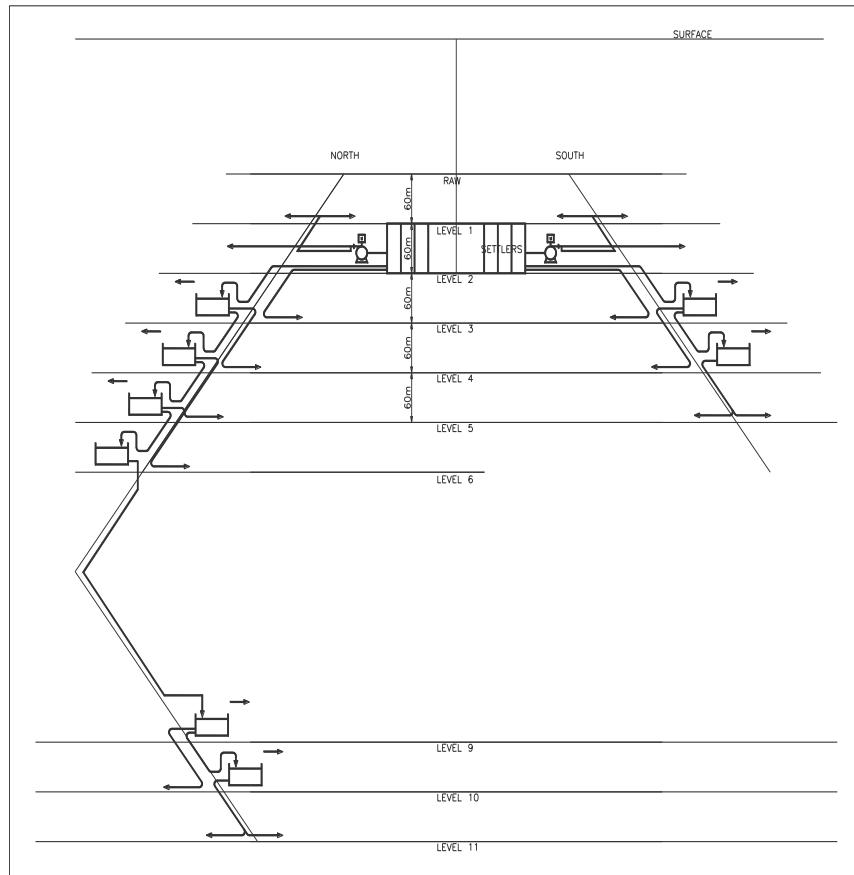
SCHEMATIC FOR SERVICE WATER HANDLING
